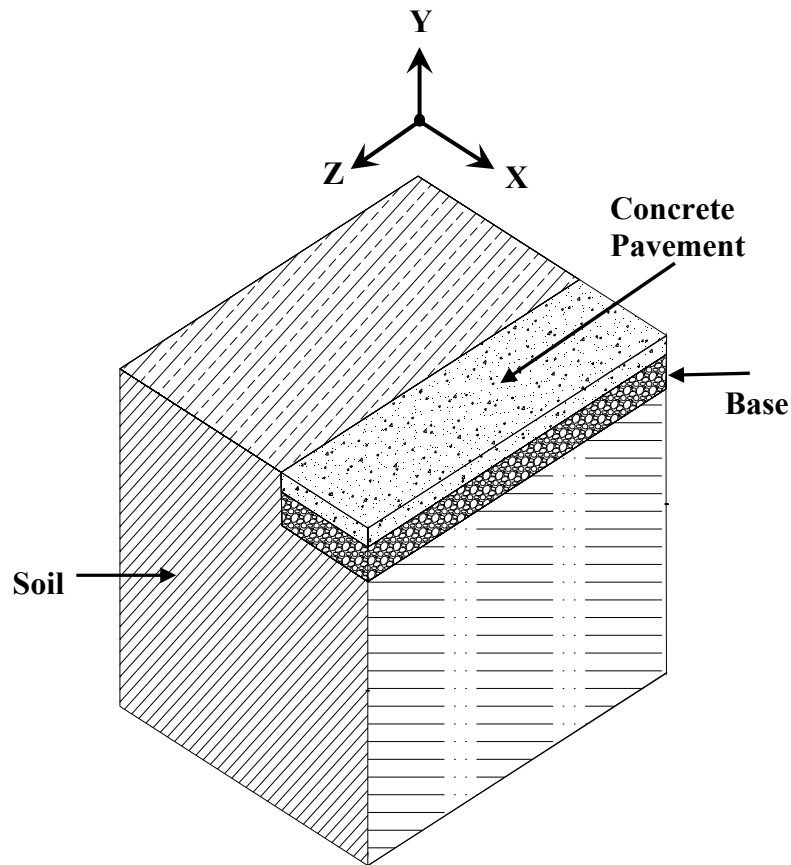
Schematic View of Quarter of the Jointed Plain Concrete Pavement System
